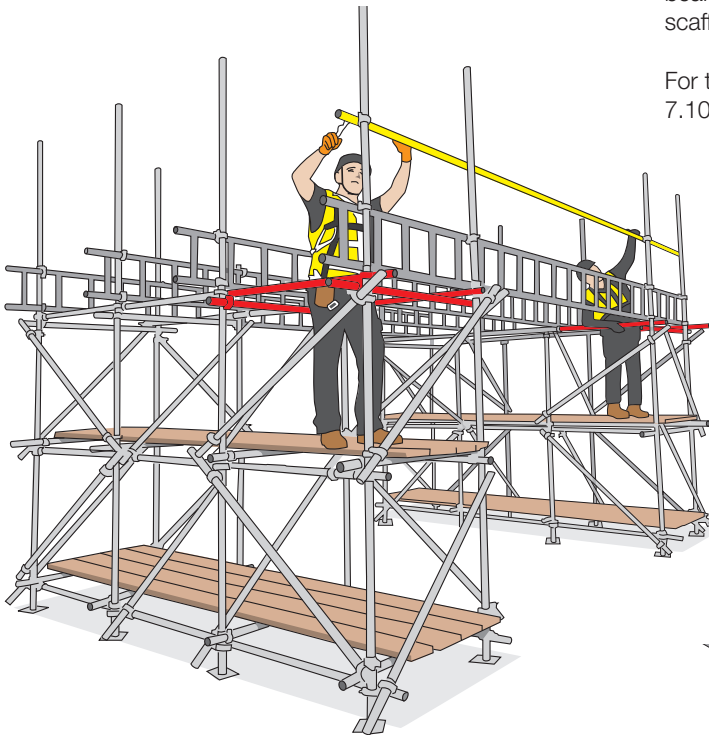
Examples of collective protection for the construction of gantry scaffolding.
